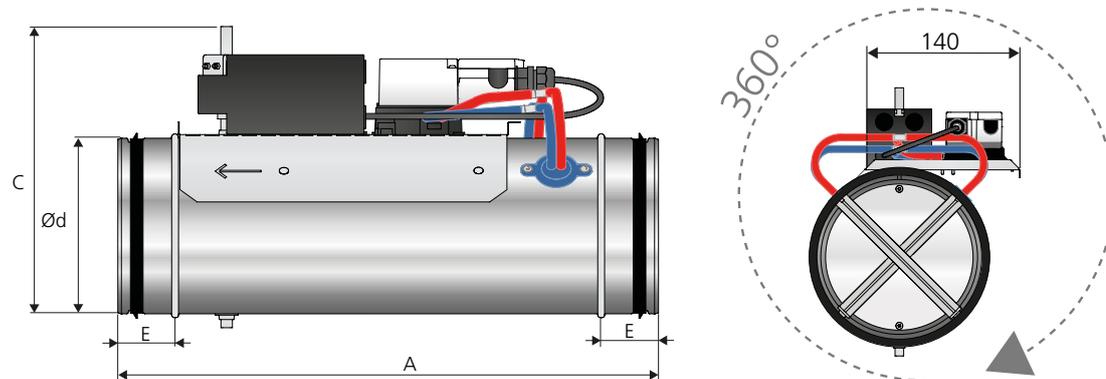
Dimensions (mm), REACT V-SR GMB. The damper can be installed at an optional angle.
